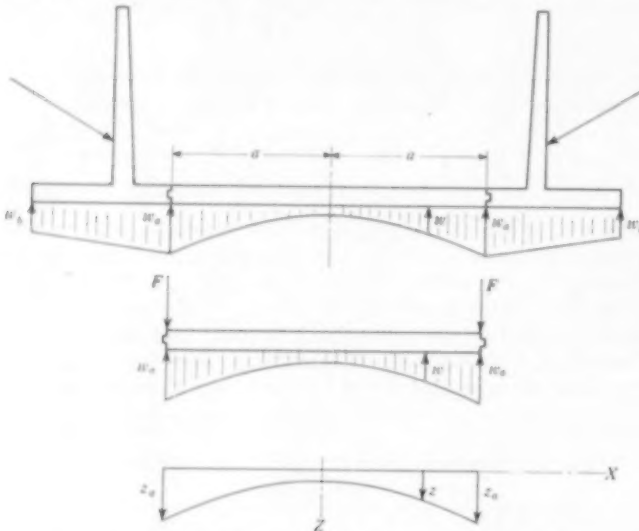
SECTION OF SPILLWAY CHANNEL AND LOADING
